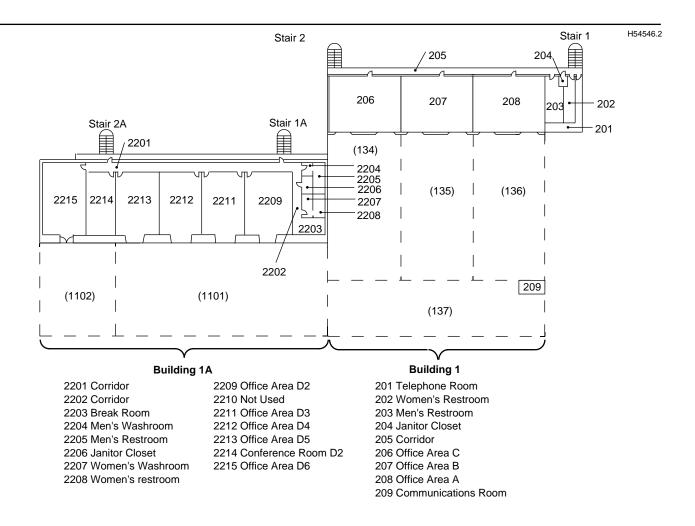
Second-Level Floor Plan, Building 1/1A, Astrotech
